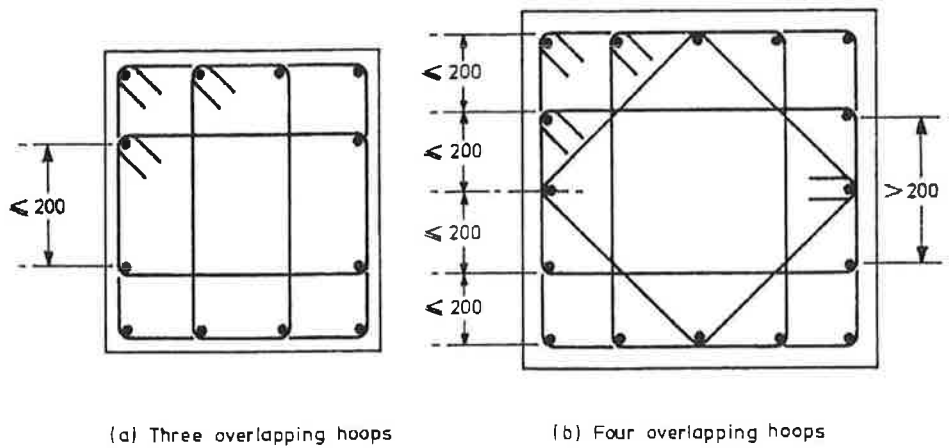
TYPICAL DETAILS USING OVERLAPPING HOOPS
